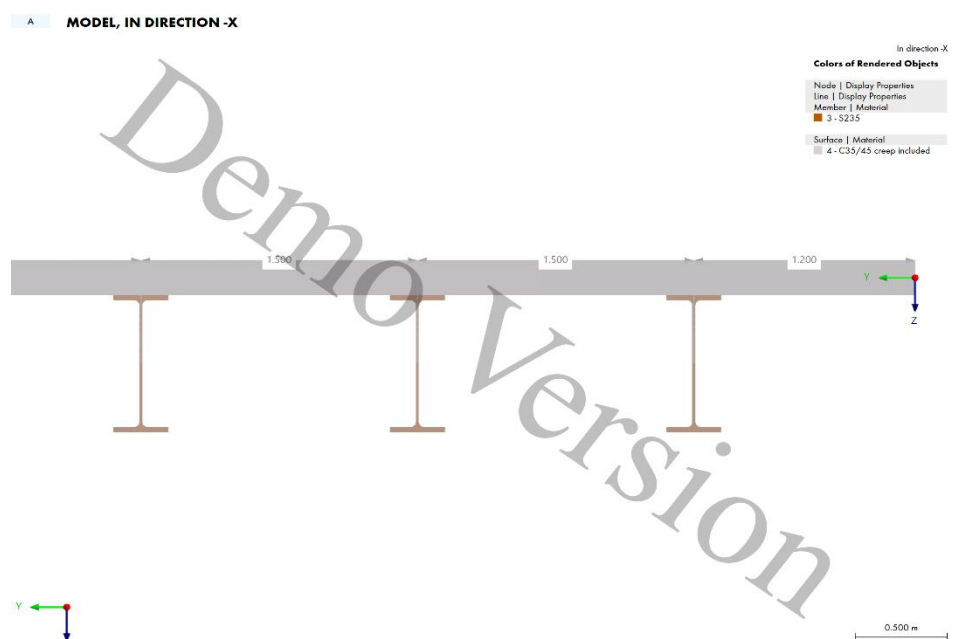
Visualization of right vertical alignment between the concrete surface and the steel beams by implementing an eccentricity.
